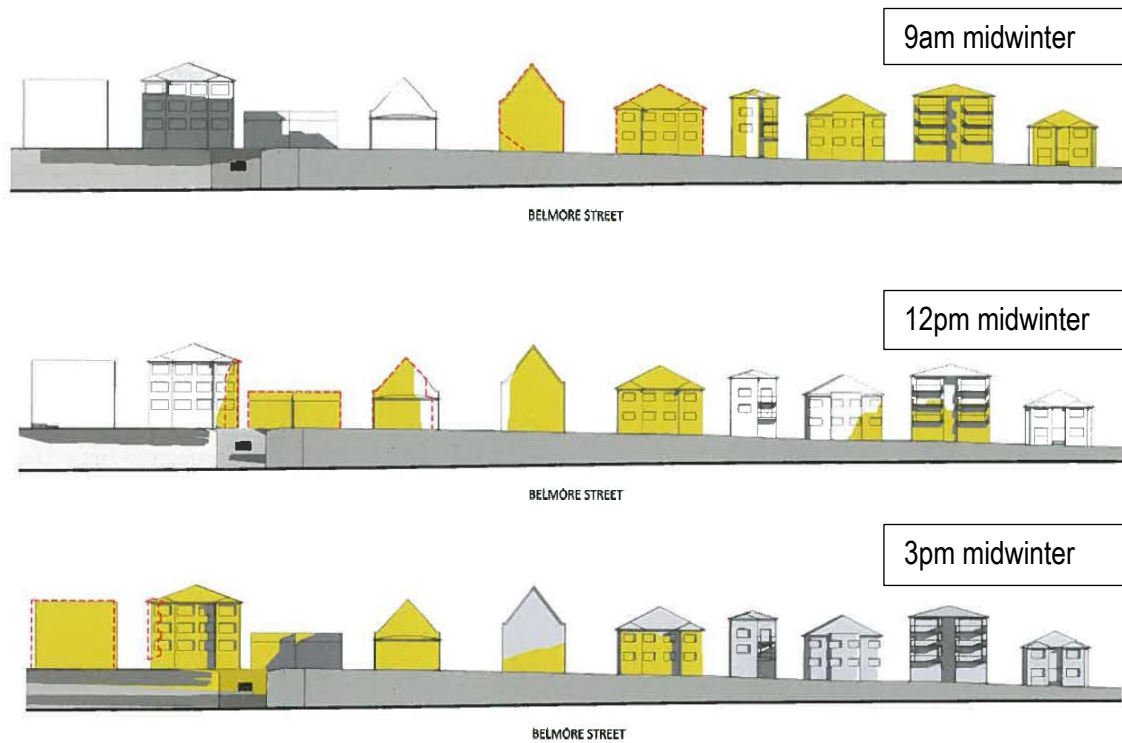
Shadow impacts on northern elevations of buildings in Belmore Street
